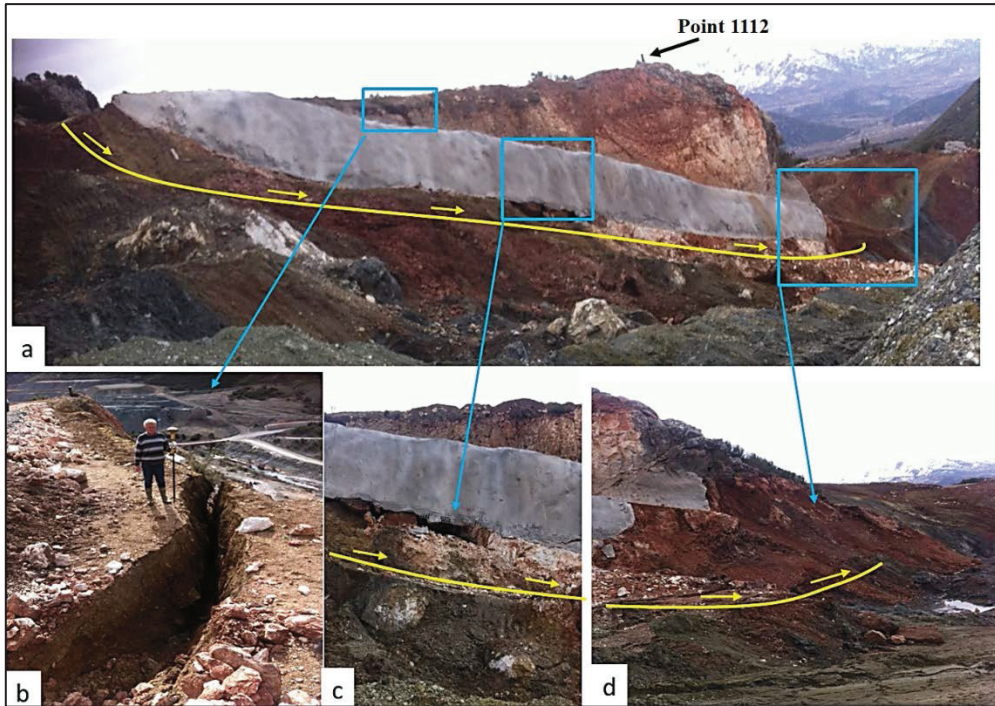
a) View of SLD2 slope failure, b) tension crack of the SLD2 failure, c) water bearing karstic cave within limestone block on radiolarite and ophiolite basement, d) slope excavation in the toe of the SLD2 slope failure and water accumulation.
